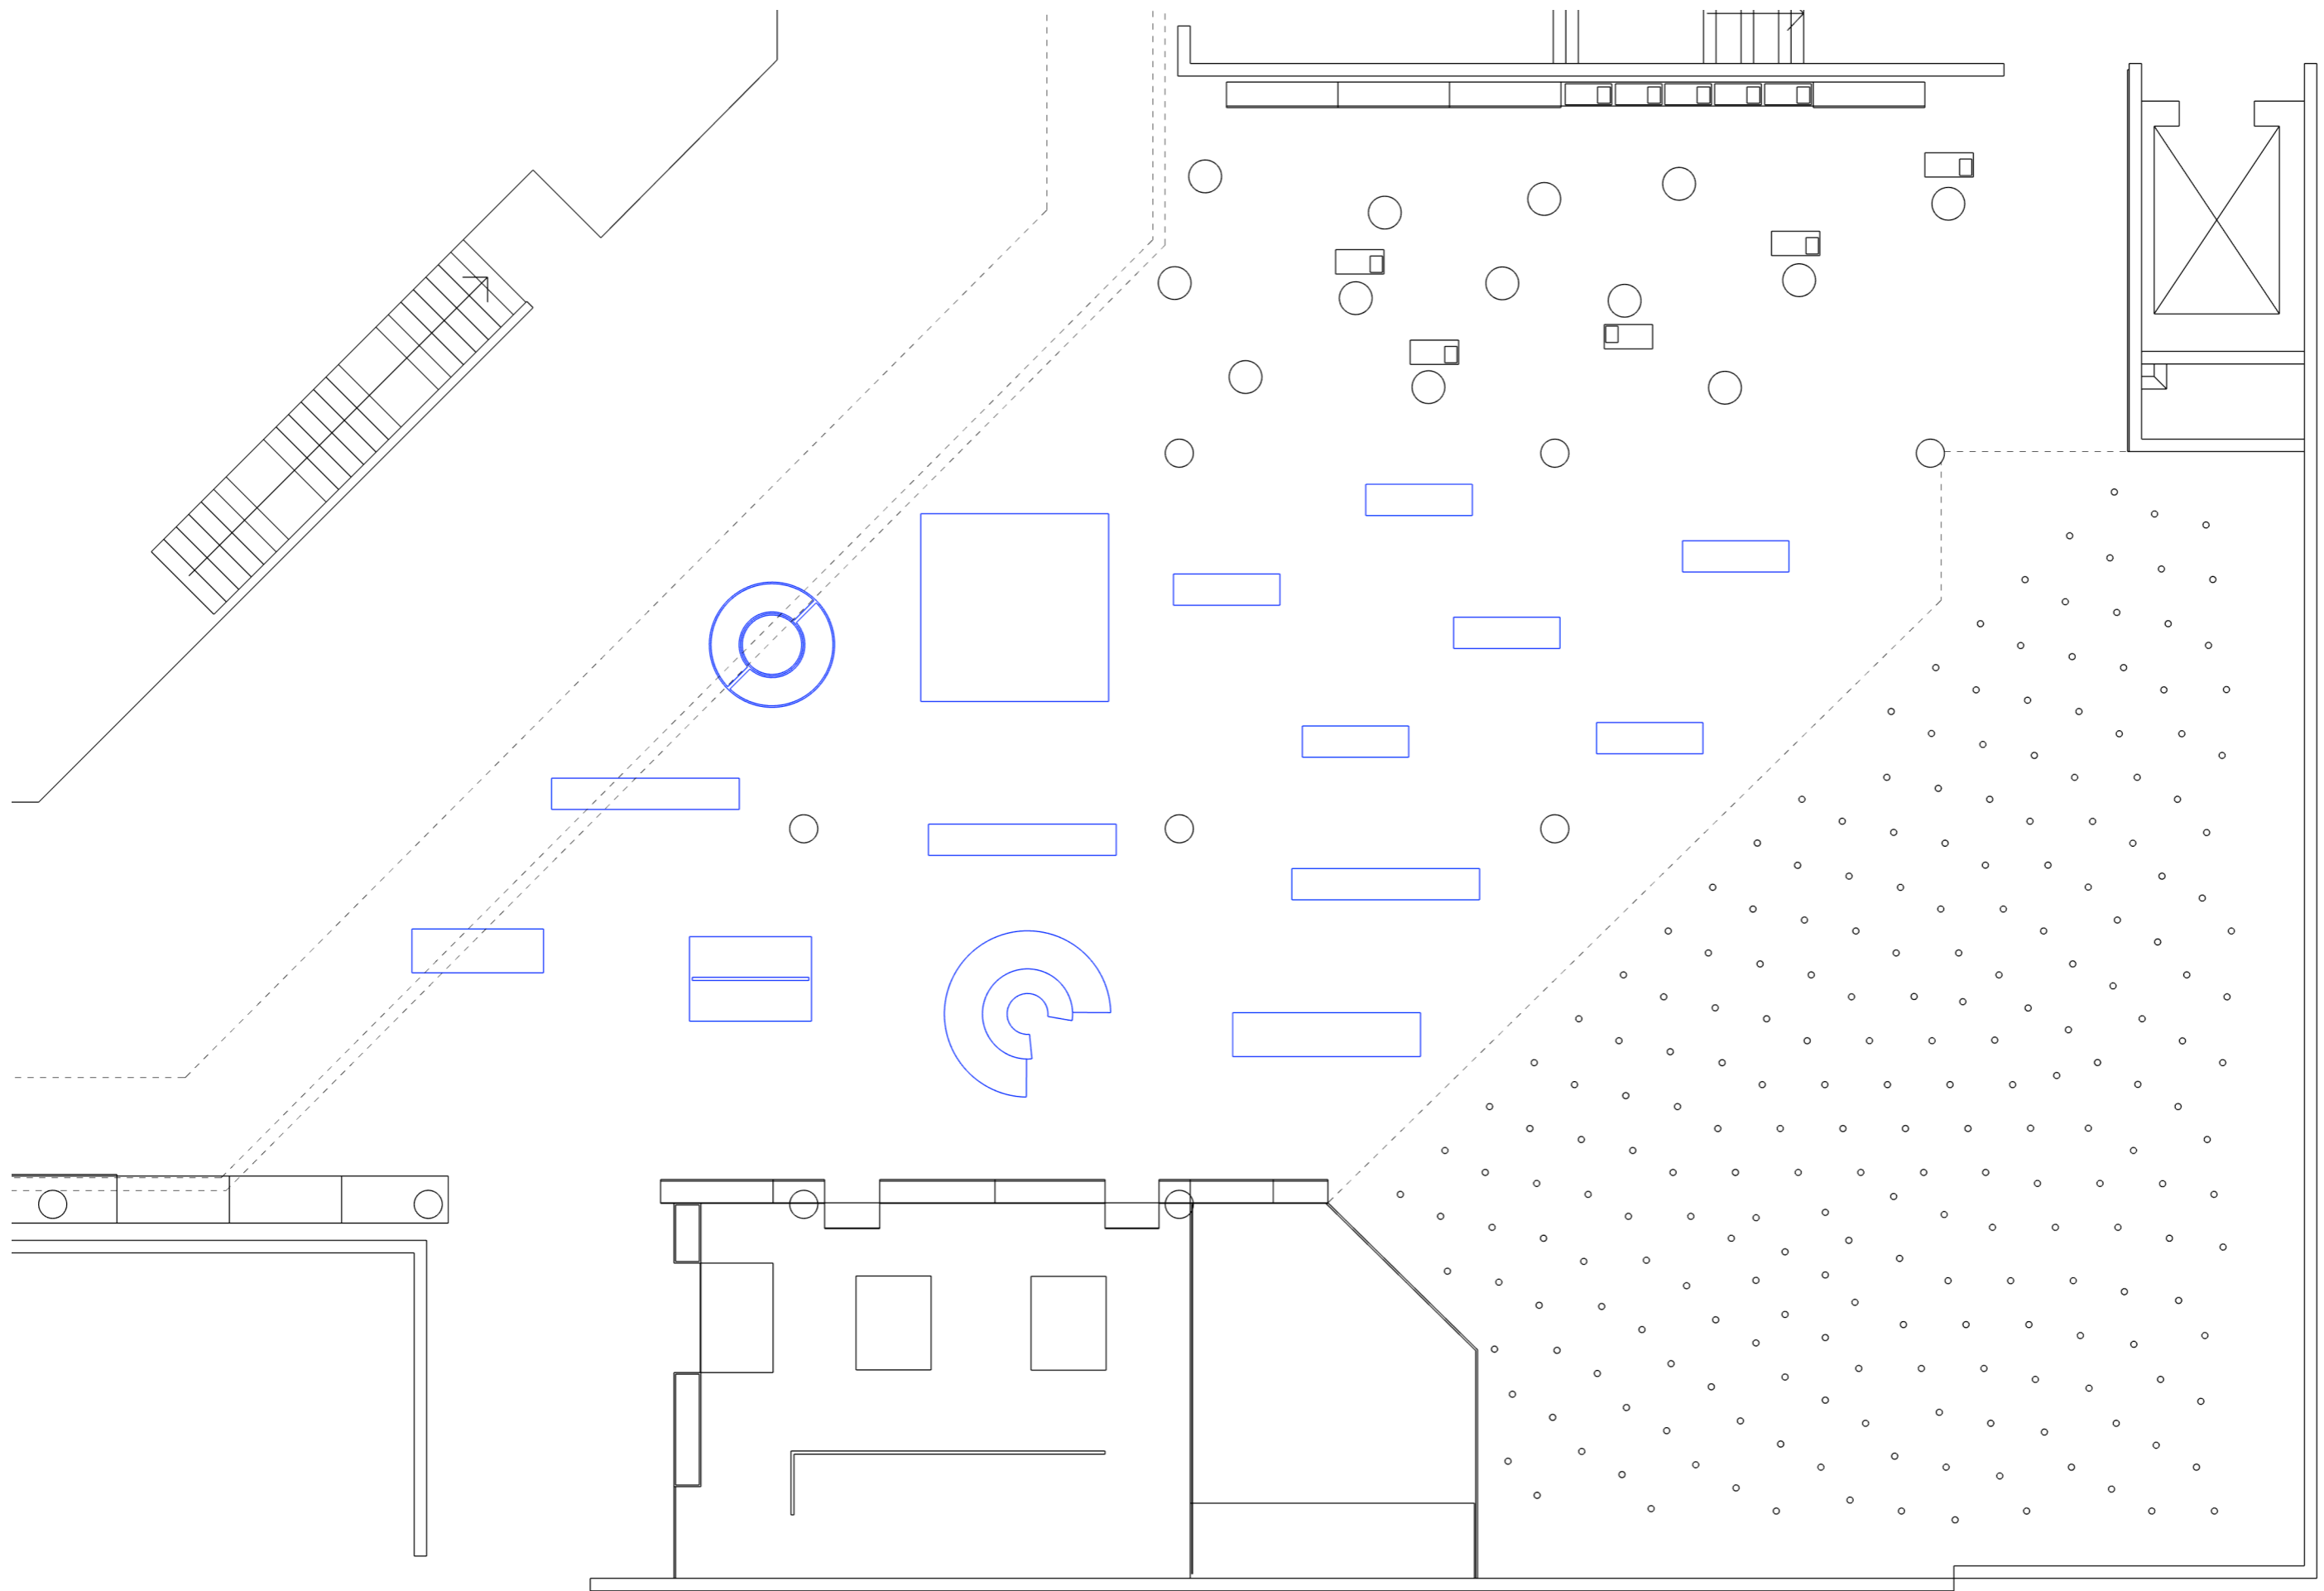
PLAN OF CHANGES IN EXHIBITION, 1:100
